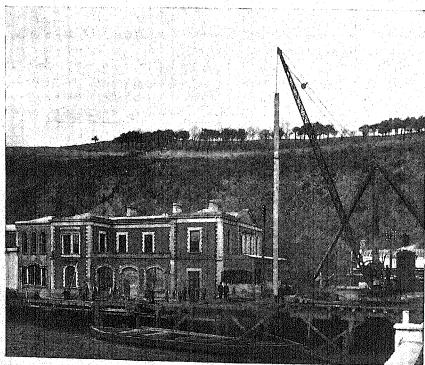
Ferro-concrete Pile, 62 ft. long, section 16 in. by 16 in.
